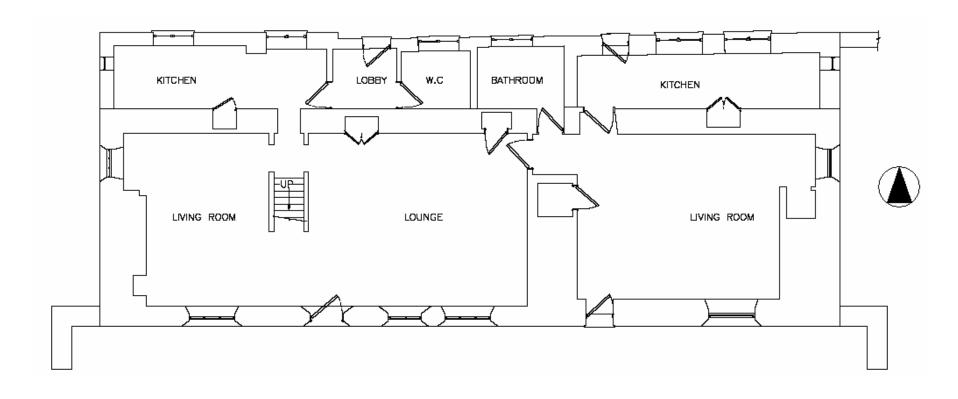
Ground-floor plan (Morton & Hall Consulting Ltd)
